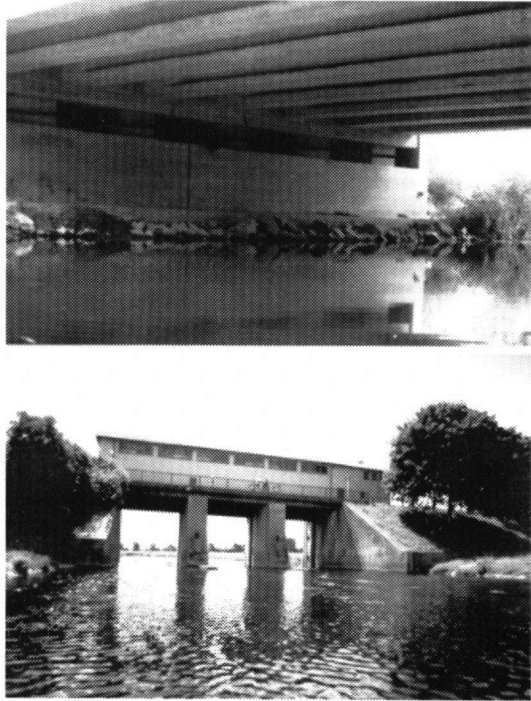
Construction of bridge I (top) and bridge III (bottom).
